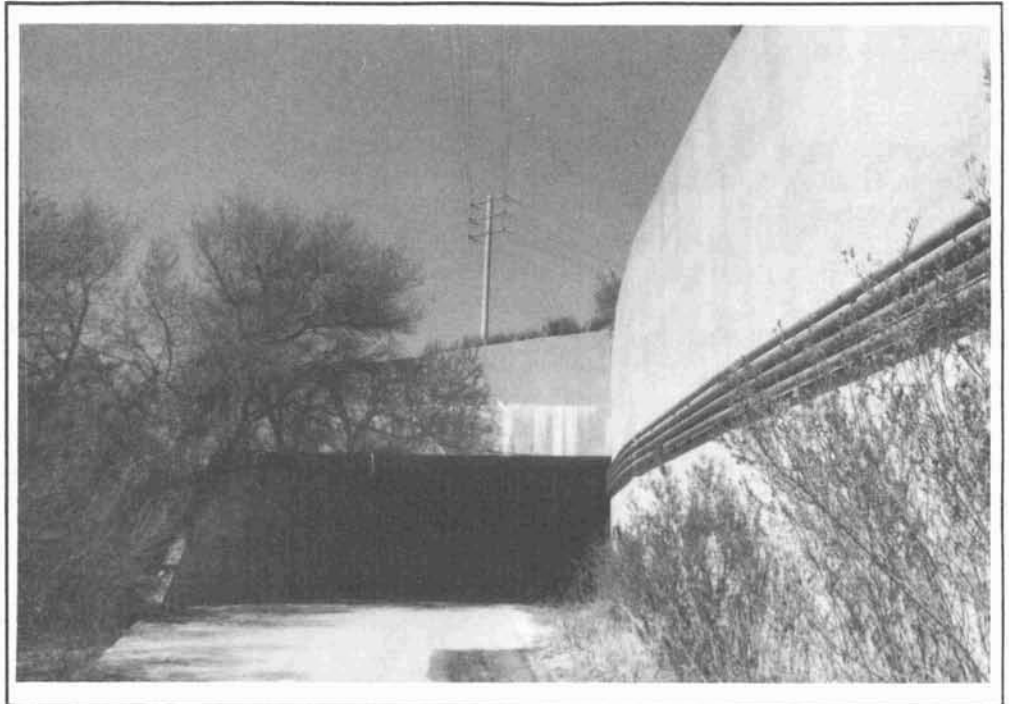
Fiber Optic Conduits Heading Under I-15, Attached to a Concrete Culvert Wall
